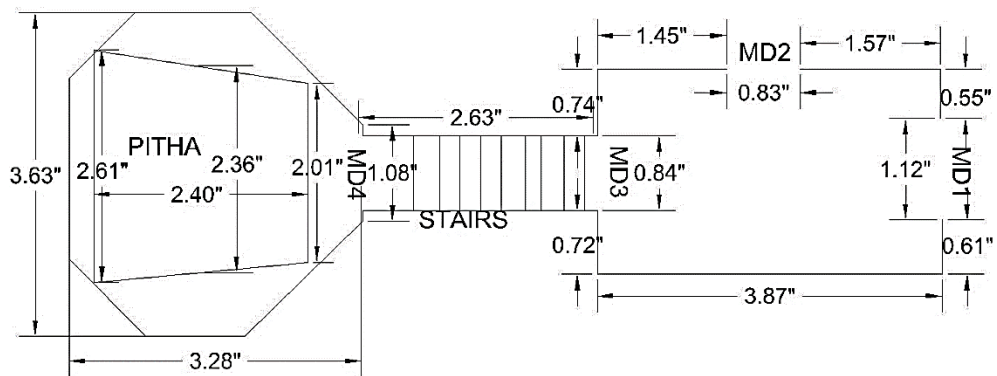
AutoCAD Ground Plan of Siddheswara Temple (Outer Plan and inner plan)
